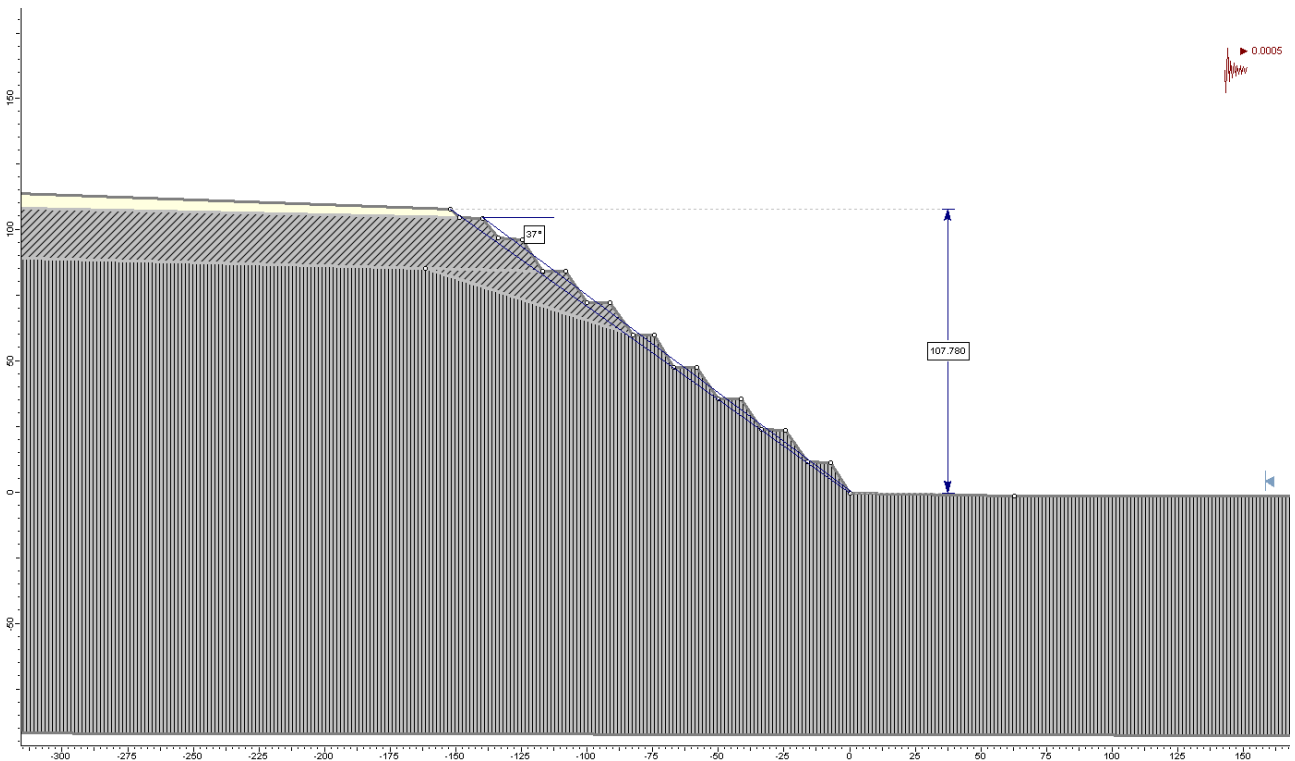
Cross-section through the north wall of Pit 3-4.
